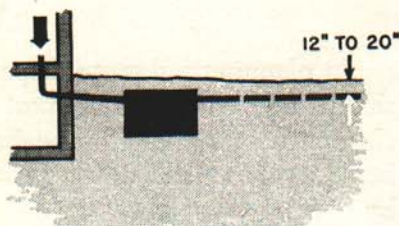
A. A sump pump would be needed to pump sewage from basement fixtures into septic tank when ground does not slope away from house.
